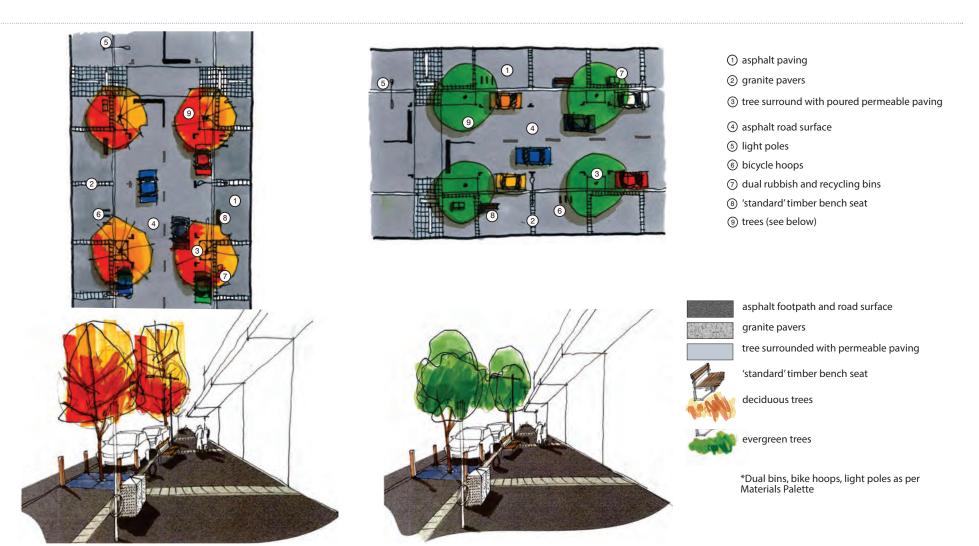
North-South Connector Street sketch (bottom left) and plan (top left) and East-West Connector Street sketch (bottom right) and plan (top right) showing application of materials and street furniture
